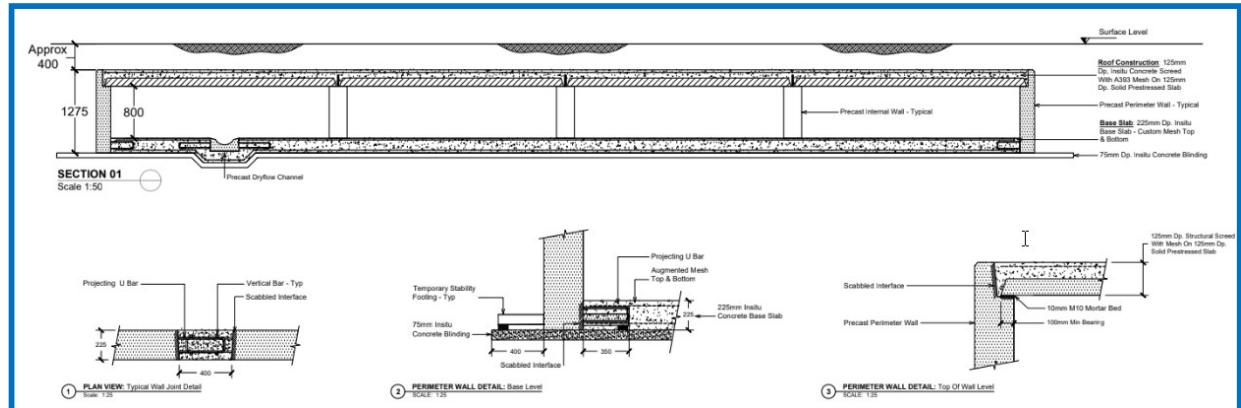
Attenuation RC tanks -typical installation & cross section (Carlow tanks)
